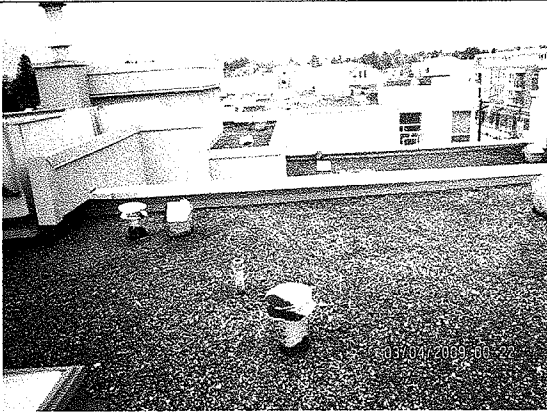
This photo shows that the original roof was built with a definite slope for outside parapets too the drains in the centre of the roof.
